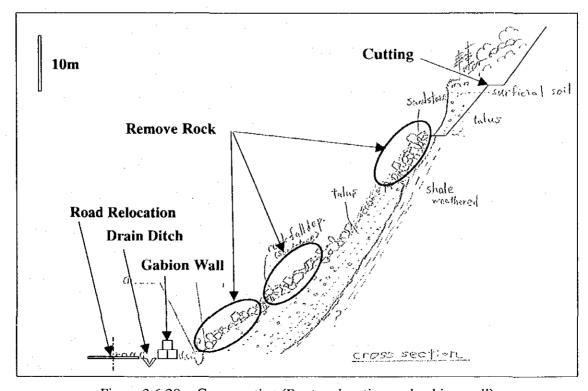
Cross section (Route relocation and gabion wall)
